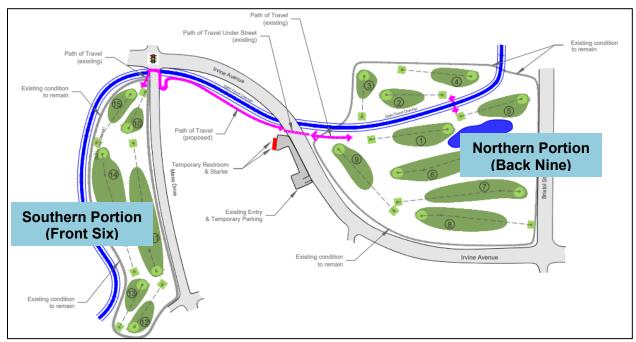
, A conceptual plan showing the temporary layout with golf cart access shown in pink
